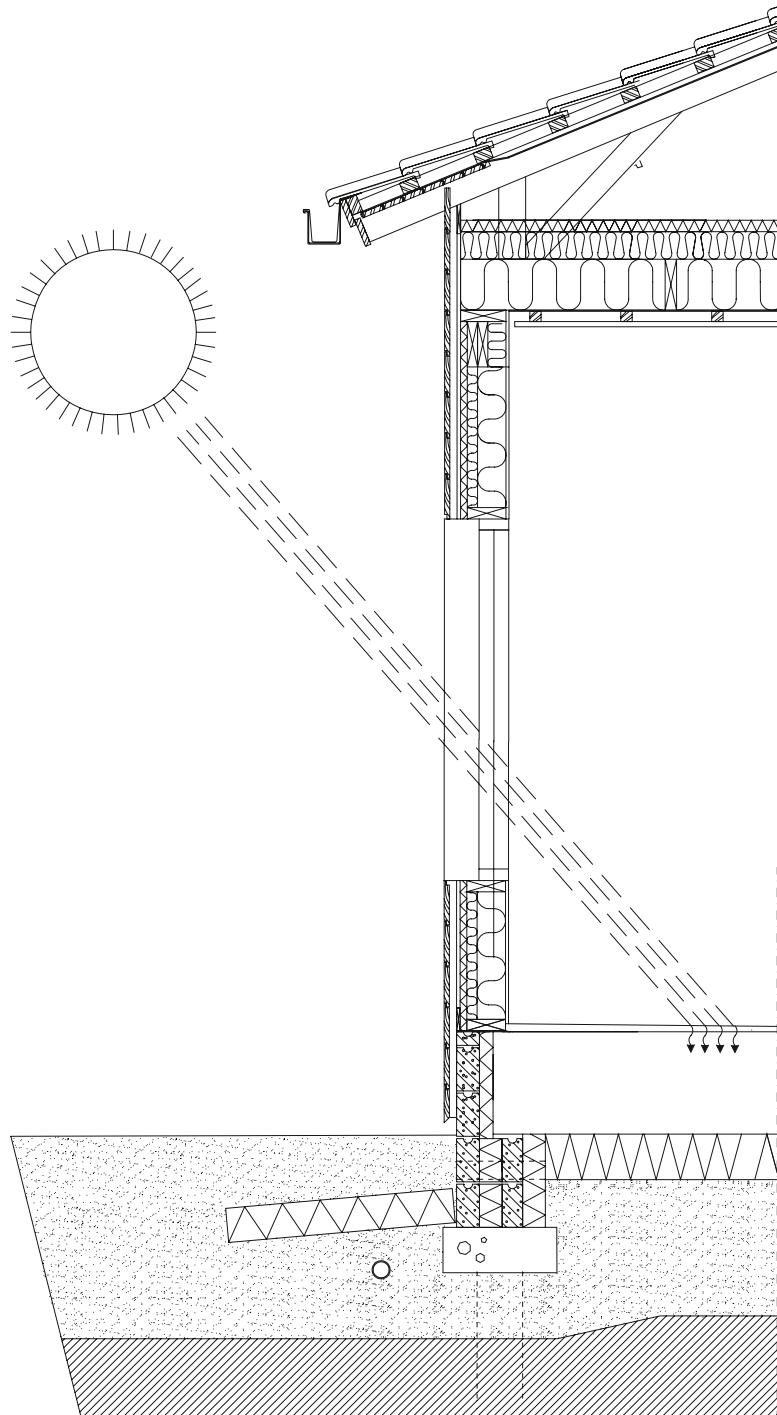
FOUNDATIONS FOR RAISED FLOORS.
